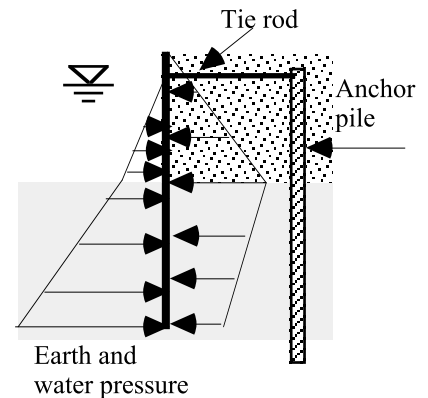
Schematic diagram of sheet-pile wall supported by anchorage
